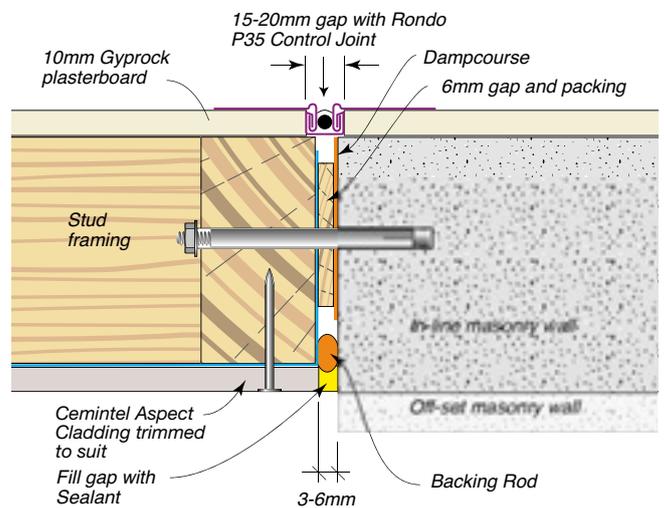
Junction of Aspect Cladding System with Offset or In-line Masonry Wall – Plan View
